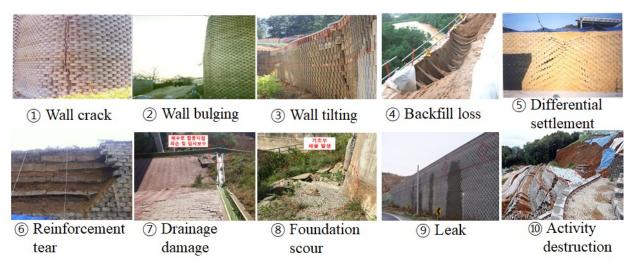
Damage type of reinforced earth retaining wall(Some of these figures use press releases)
